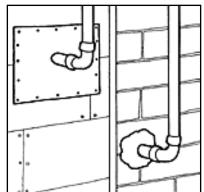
Rodentproof openings around pipes with sheetmetal (left) and concrete (right).
